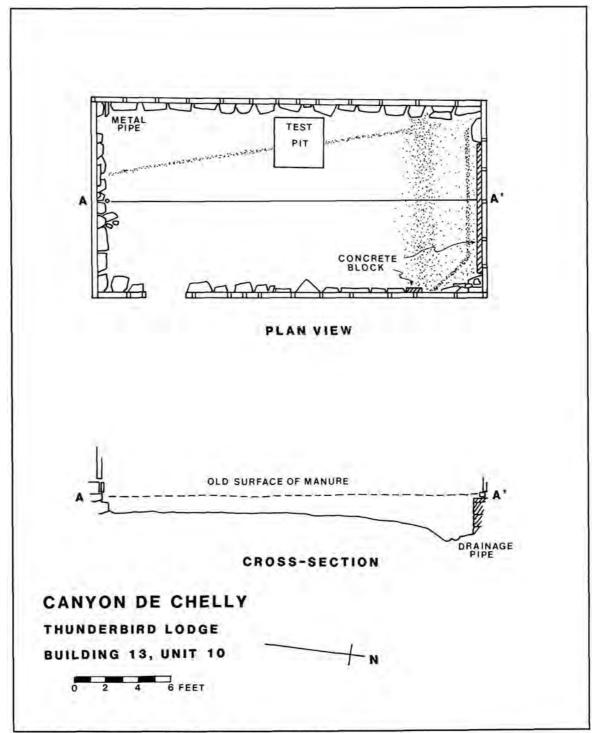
Plan and profile of Building 13, Guest Unit 10.
